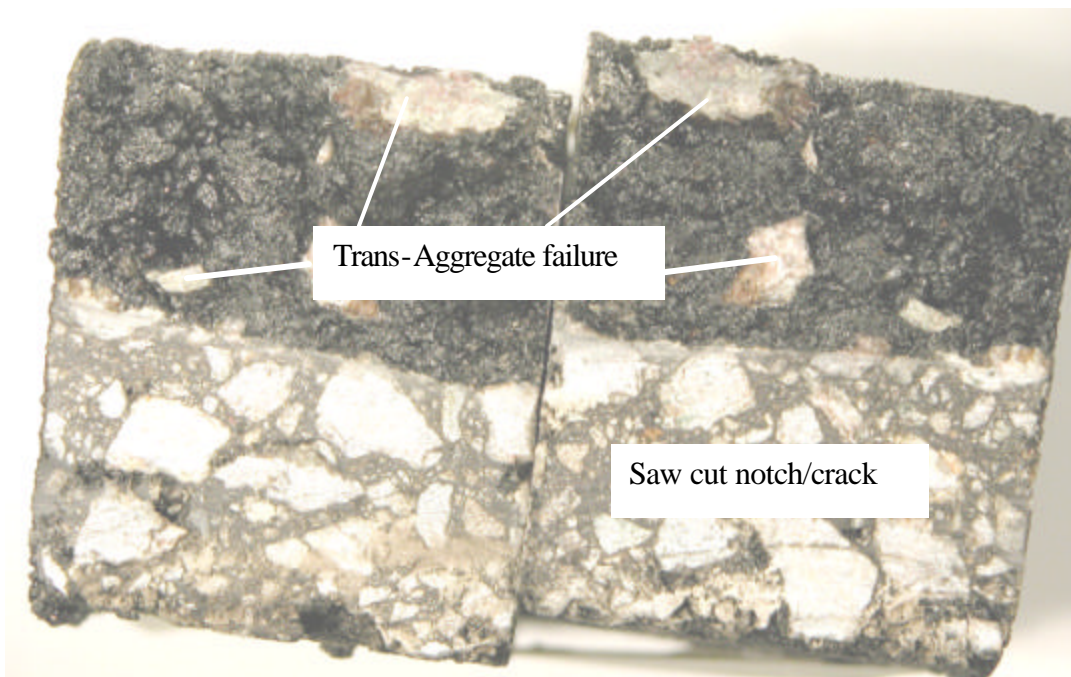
Crack face and fracture surfaces obtained from dynamic fracture testing.
